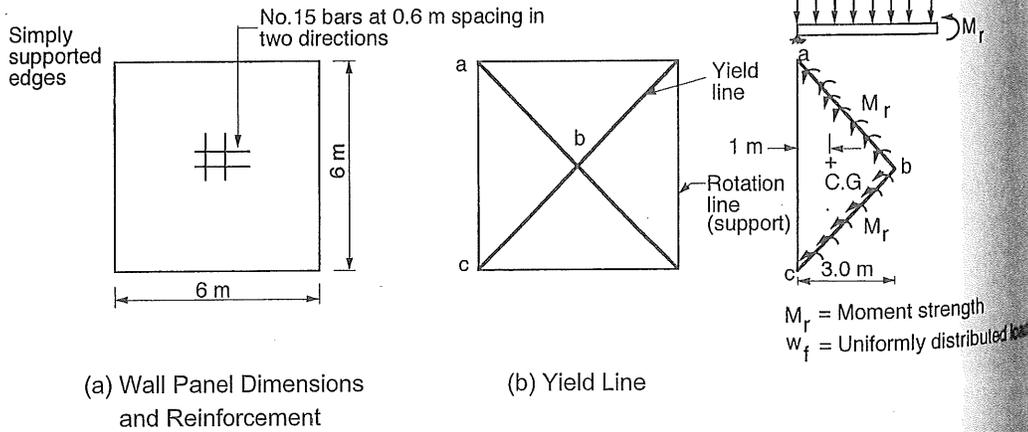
Reinforced masonry wall under two-way bending for Example 6.4.
